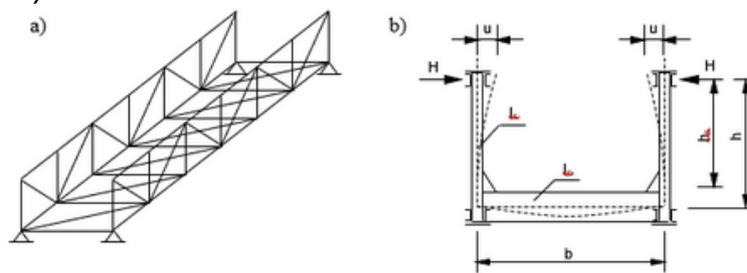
Example of an open truss bridge: a) view, b) cross-section
